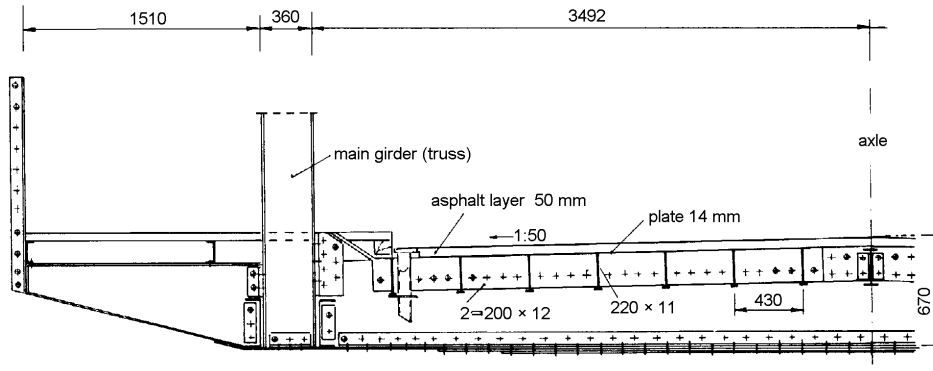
Stiffened steel deck with ship building profiles (Hasenhub Brodge in Meppen, Germany), 1947, [MAN, 1957].
